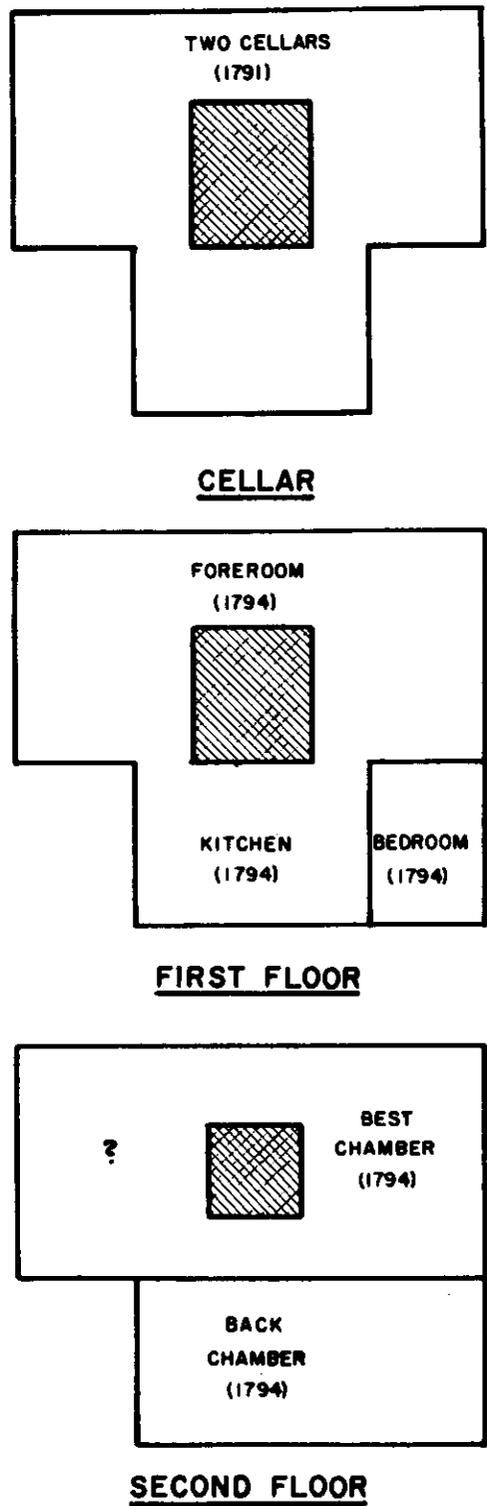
Keune's conjectural sketch of 18th century floor plan, Job Brooks house, showing possible lean-to configuration (Keune 1963:Illustration #11).
